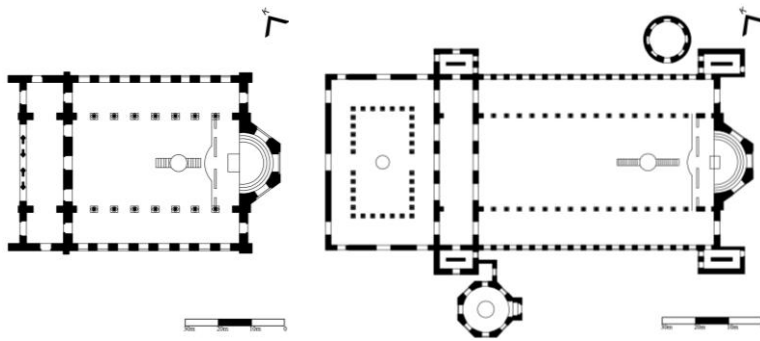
1st Church and 2nd Church Plans (Başgelen, 1994; Nur, 2016)
